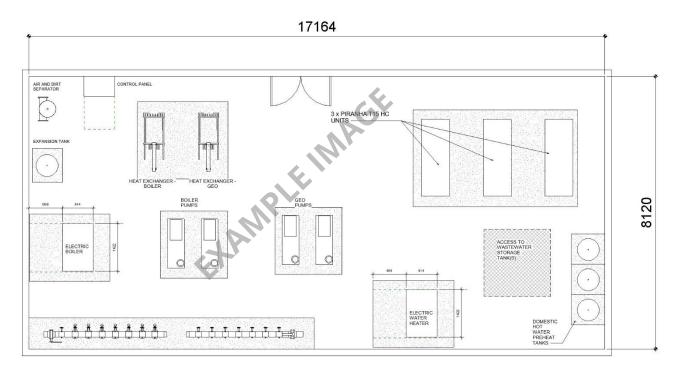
Mechanical room layout for Phase 1 – concept drawing
